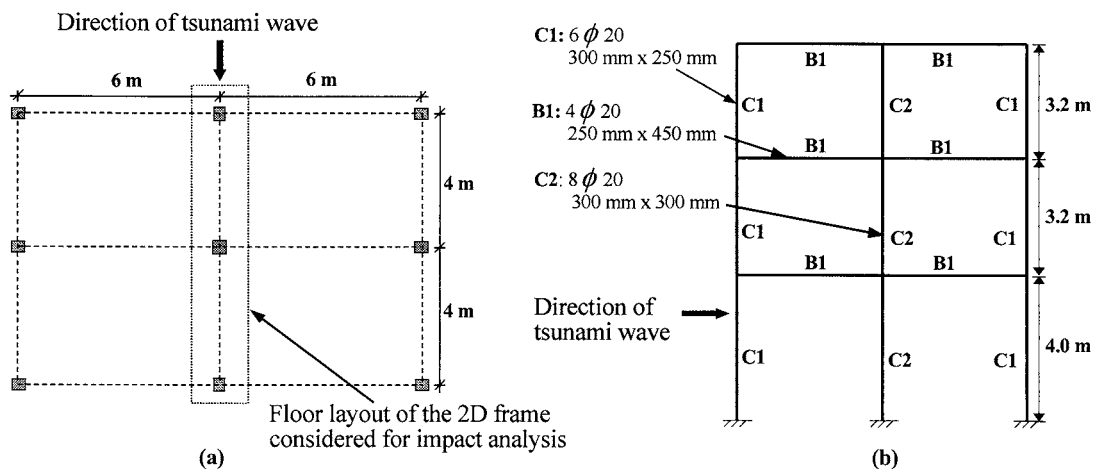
(a) Building First Floor Layout, and (b) Structural System and Column/Beam Reinforcement of 2D Frame.
